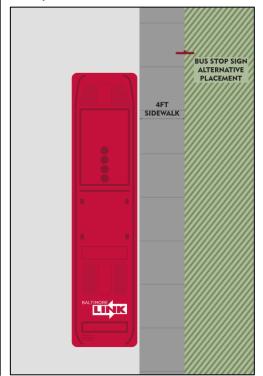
Alternative bus stop sign placement at narrow sidewalk
